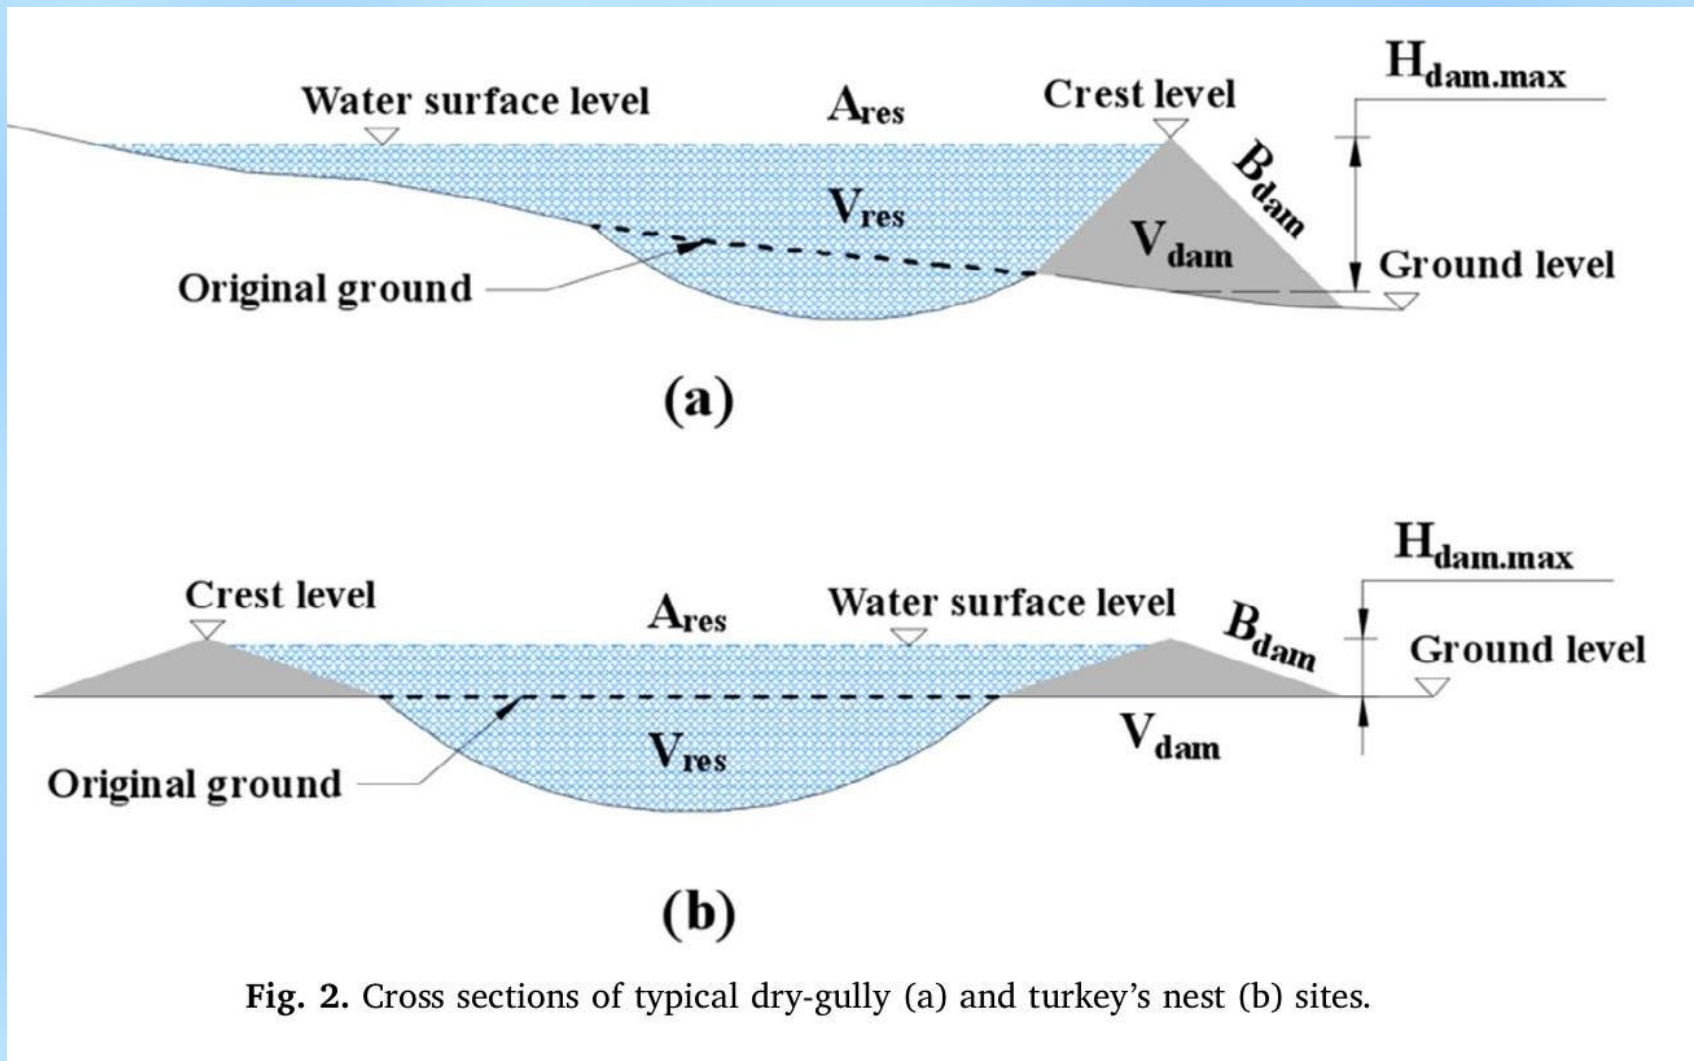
Cross sections of typical dry-gully (a) and turkey's nest (b) sites.
